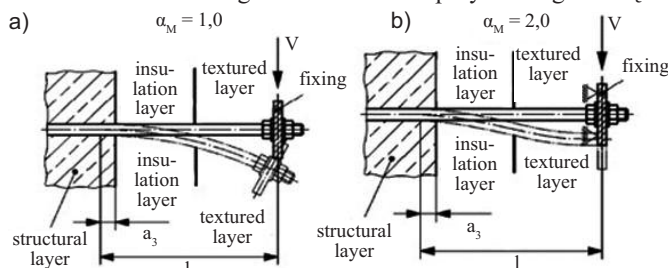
Lever arm V: a) without fixing the anchor on the concrete surface; b) with fixing the anchor on the concrete surface [10]
